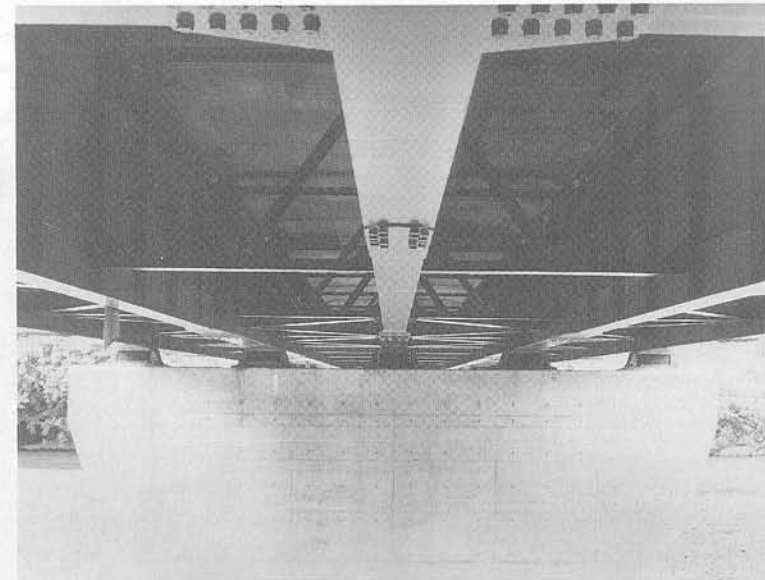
Miyagawa Bridge, Shizuoka Prefecture, showing bridge deck, isolation system and piers (photograph courtesy Oiles Corporation)
